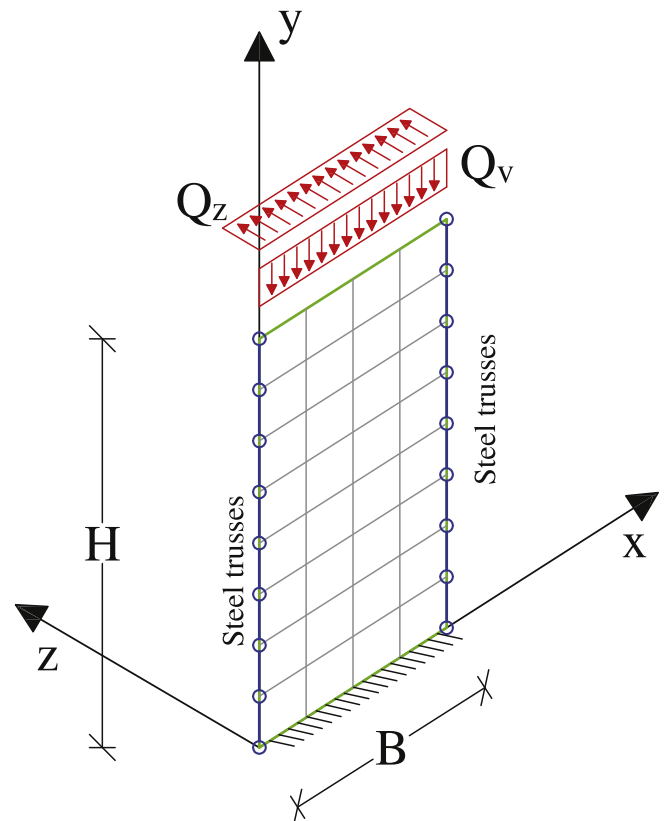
Structural scheme of wall subject to out-of-plane pushover test.
